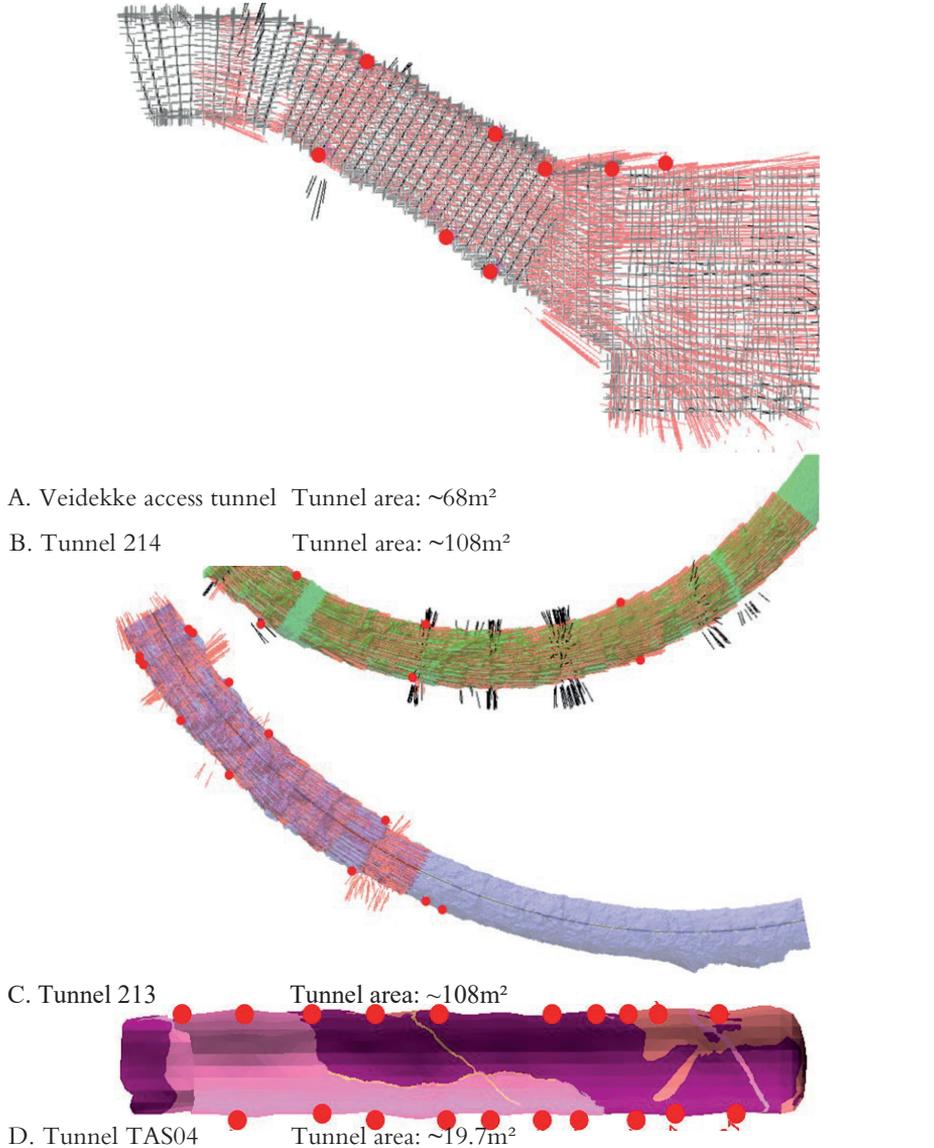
Location of diamond core holes in the four tunnels: eight drill cores in the Veidekke access tunnel (A), eight in Tunnel 214 (B), 13 in Tunnel 213 (C) and 20 in TAS04 tunnel (D).
